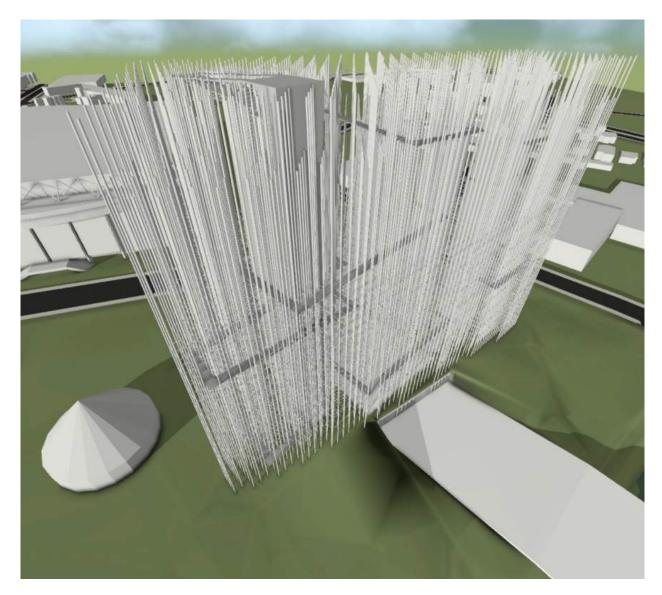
Landscaping, tree placement, interior fit out and completion of elevator and lighting systems, testing and commissioning are the last steps of construction before opening to the public as a new icon in Silicon Valley.
